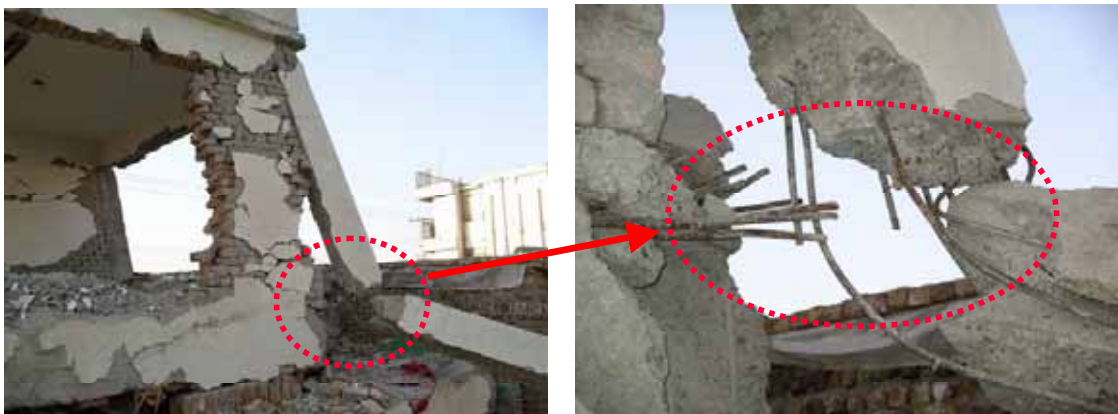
Collapsed 3 story building due to beam-column joint failure during 2005 Pakistan Earthquake
